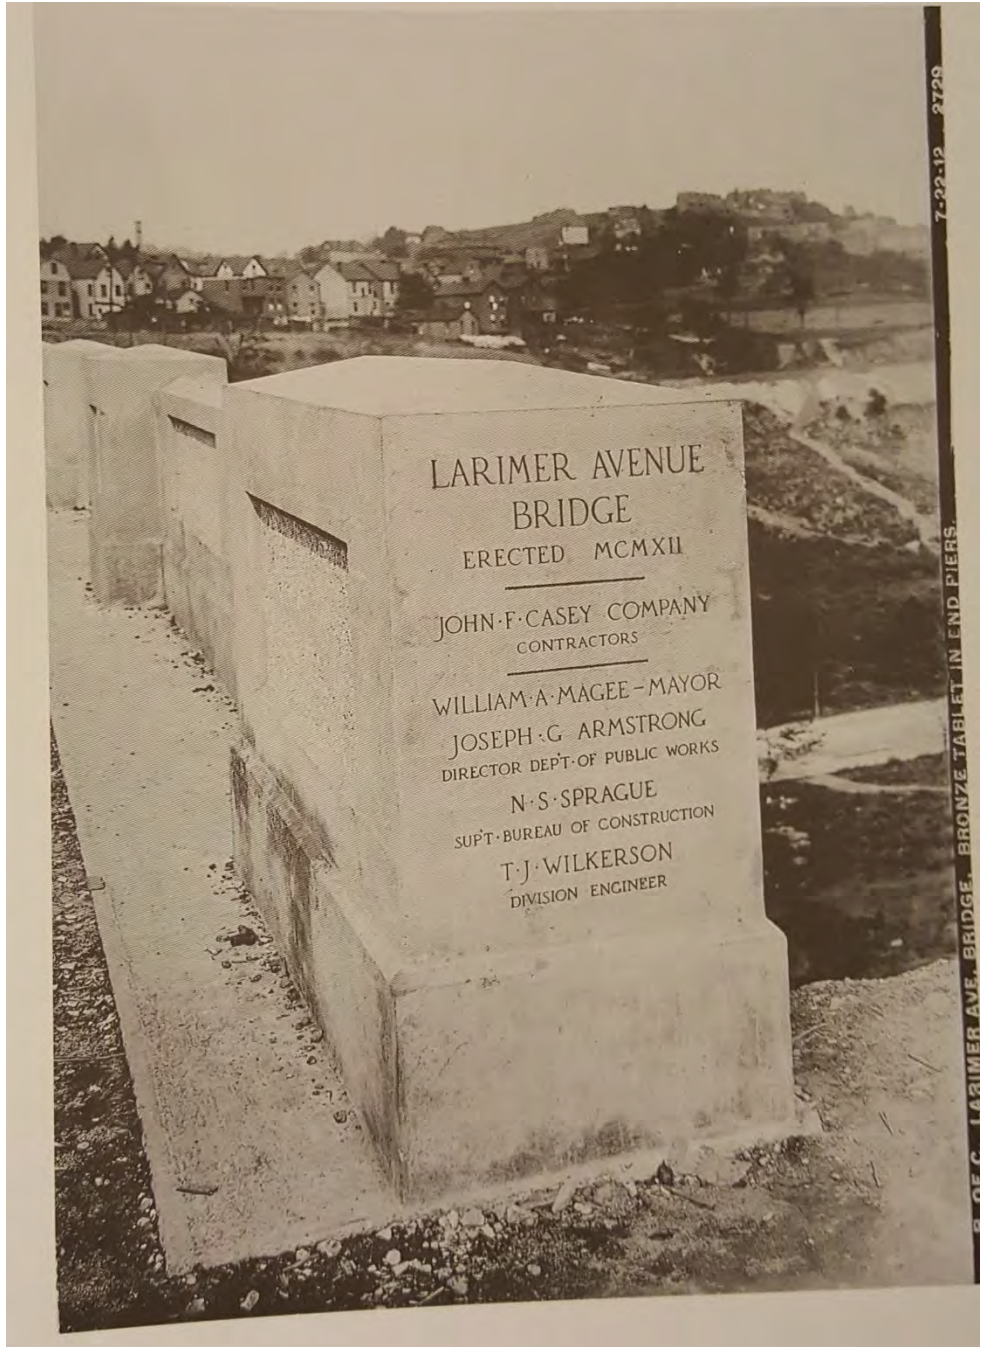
Larimer Avenue Bridge, Source: Pittsburgh's Bridges: Architecture and Engineering
